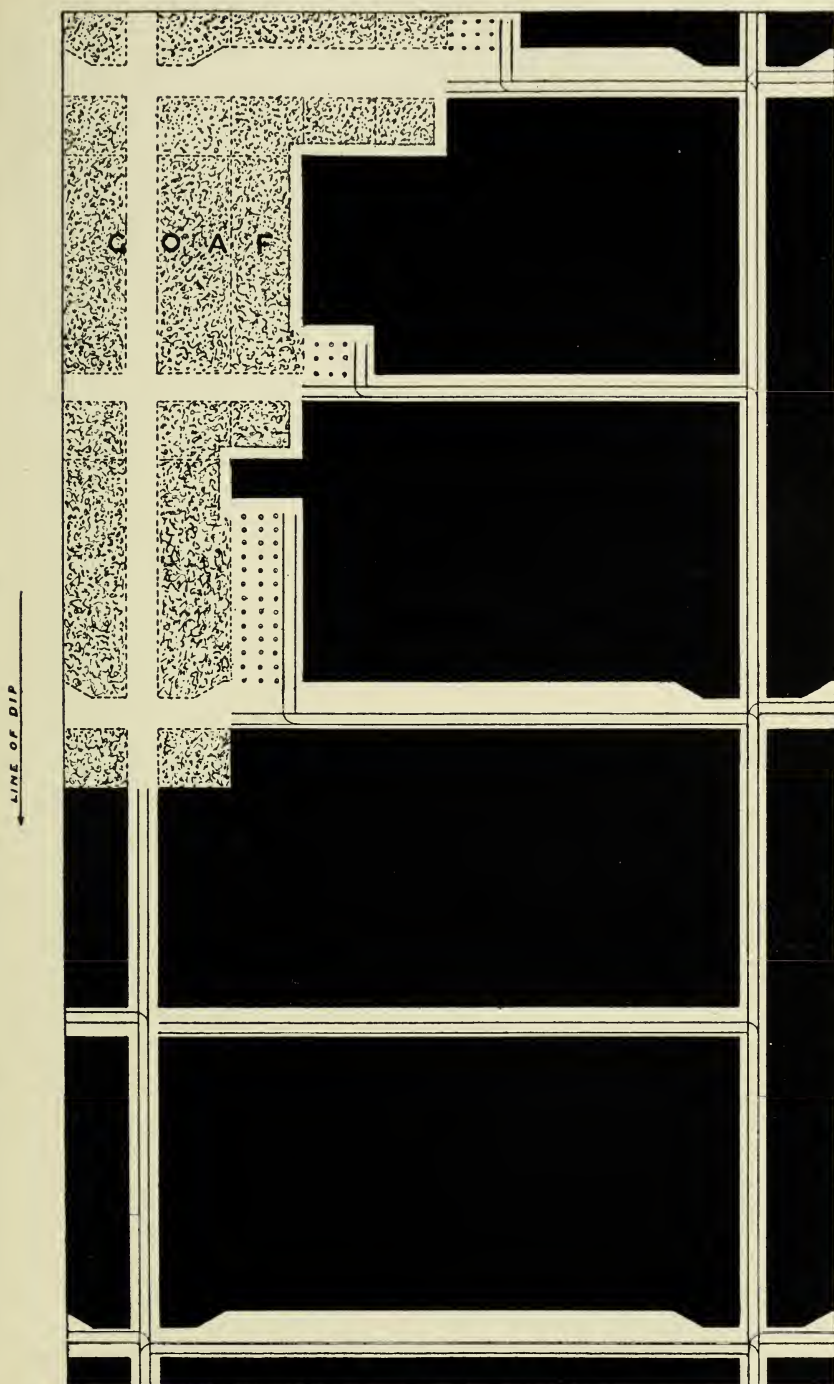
SILKSWORTH COLLIERY, NEAR SUNDERLAND, SOUTH DURHAM. PLAN SHOWING A POSSIBLE ARRANGEMENT OF PILLAR WORKING FROM ONE SIDE OF THE SPLITS, IN THE MAUDLIN SEAM.
